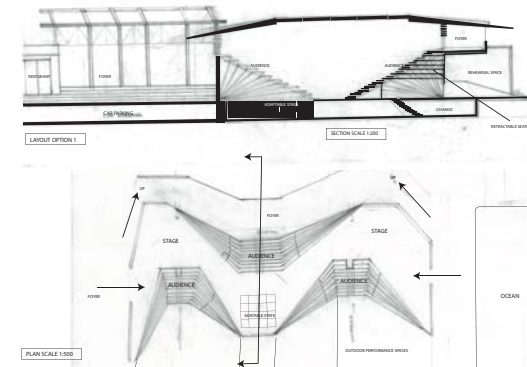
An original sketch on the theatre plan, however has been developed as it proved to be not very practical
